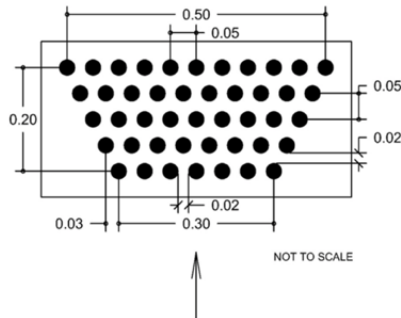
Plan of Oyster Reef Pile Structure in Trapezoidal Pattern –
